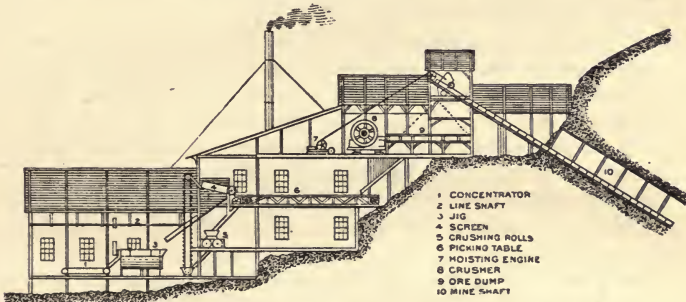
Diagram showing sectional elevation of mill (after Hobbs).
